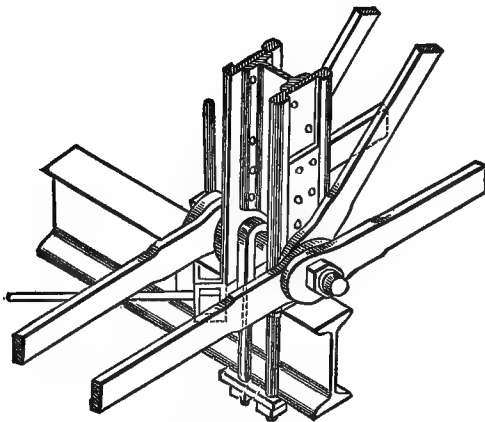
Pin-Connections at Ends of Post for a Through Bridge, American Bridge Co.
